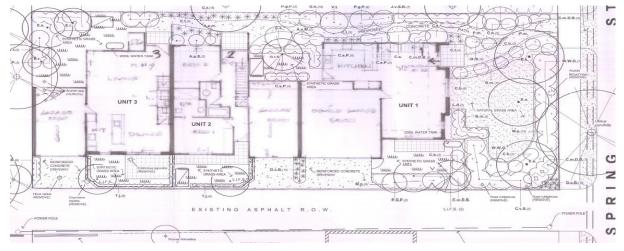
Endorsed ground floor plan of 170 Spring Street, Reservoir
